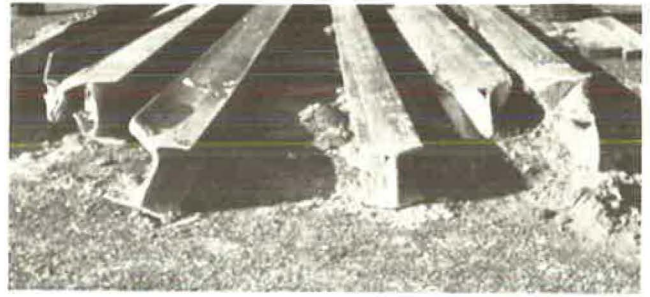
With cast-steel end protection H-piles can be driven into medium hard rock. Note how the contractor utilized salvaged guard rail.
